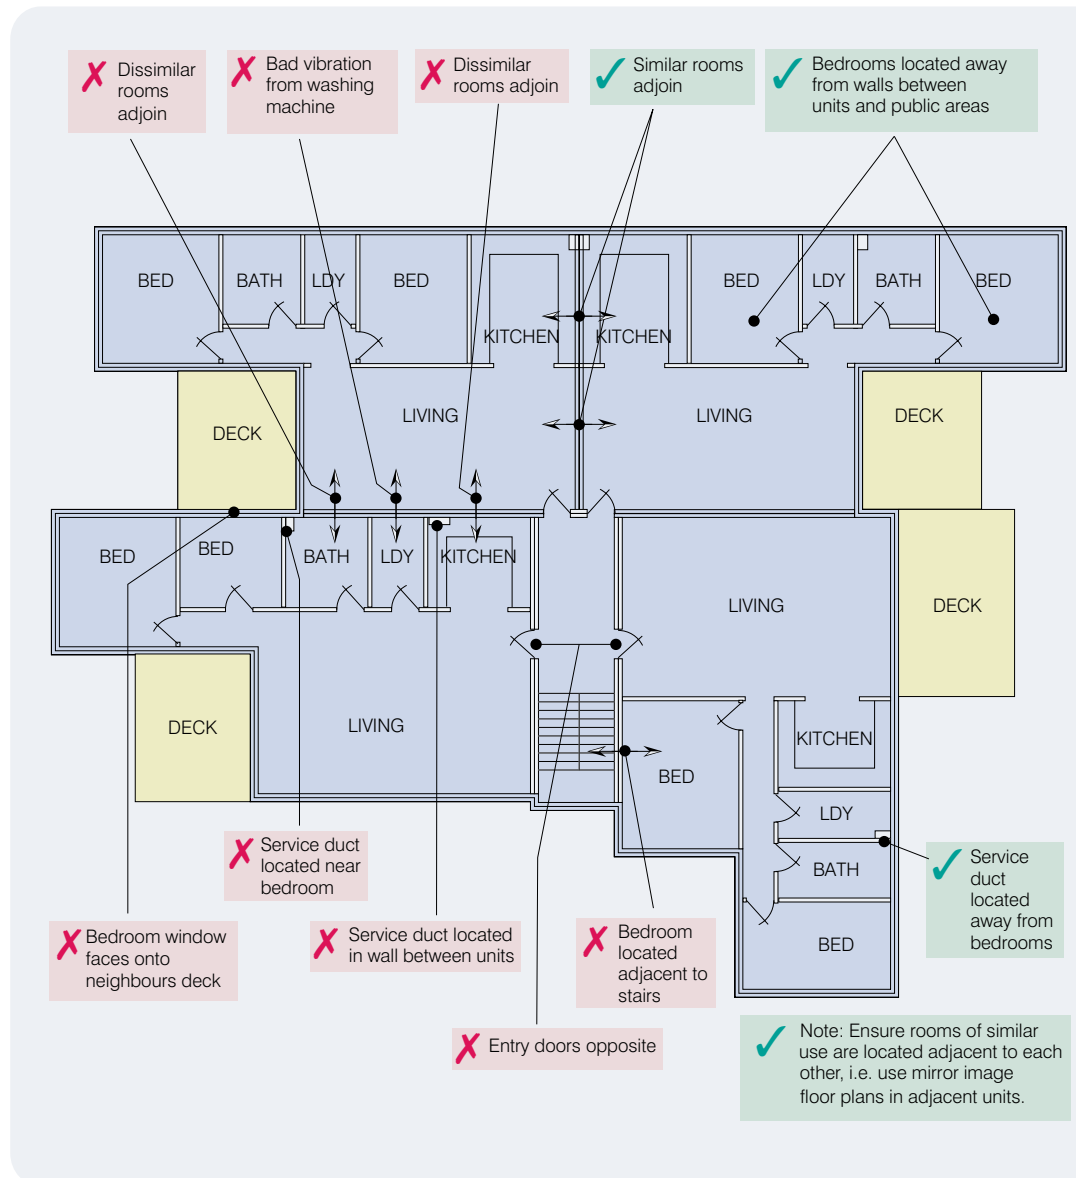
Good and bad sound design practices in building layout – plan view.
